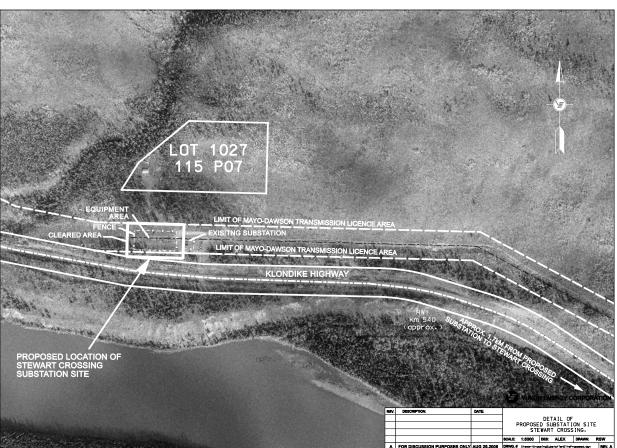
Proposed Footprint Layout of the Stewart Crossing Substation
